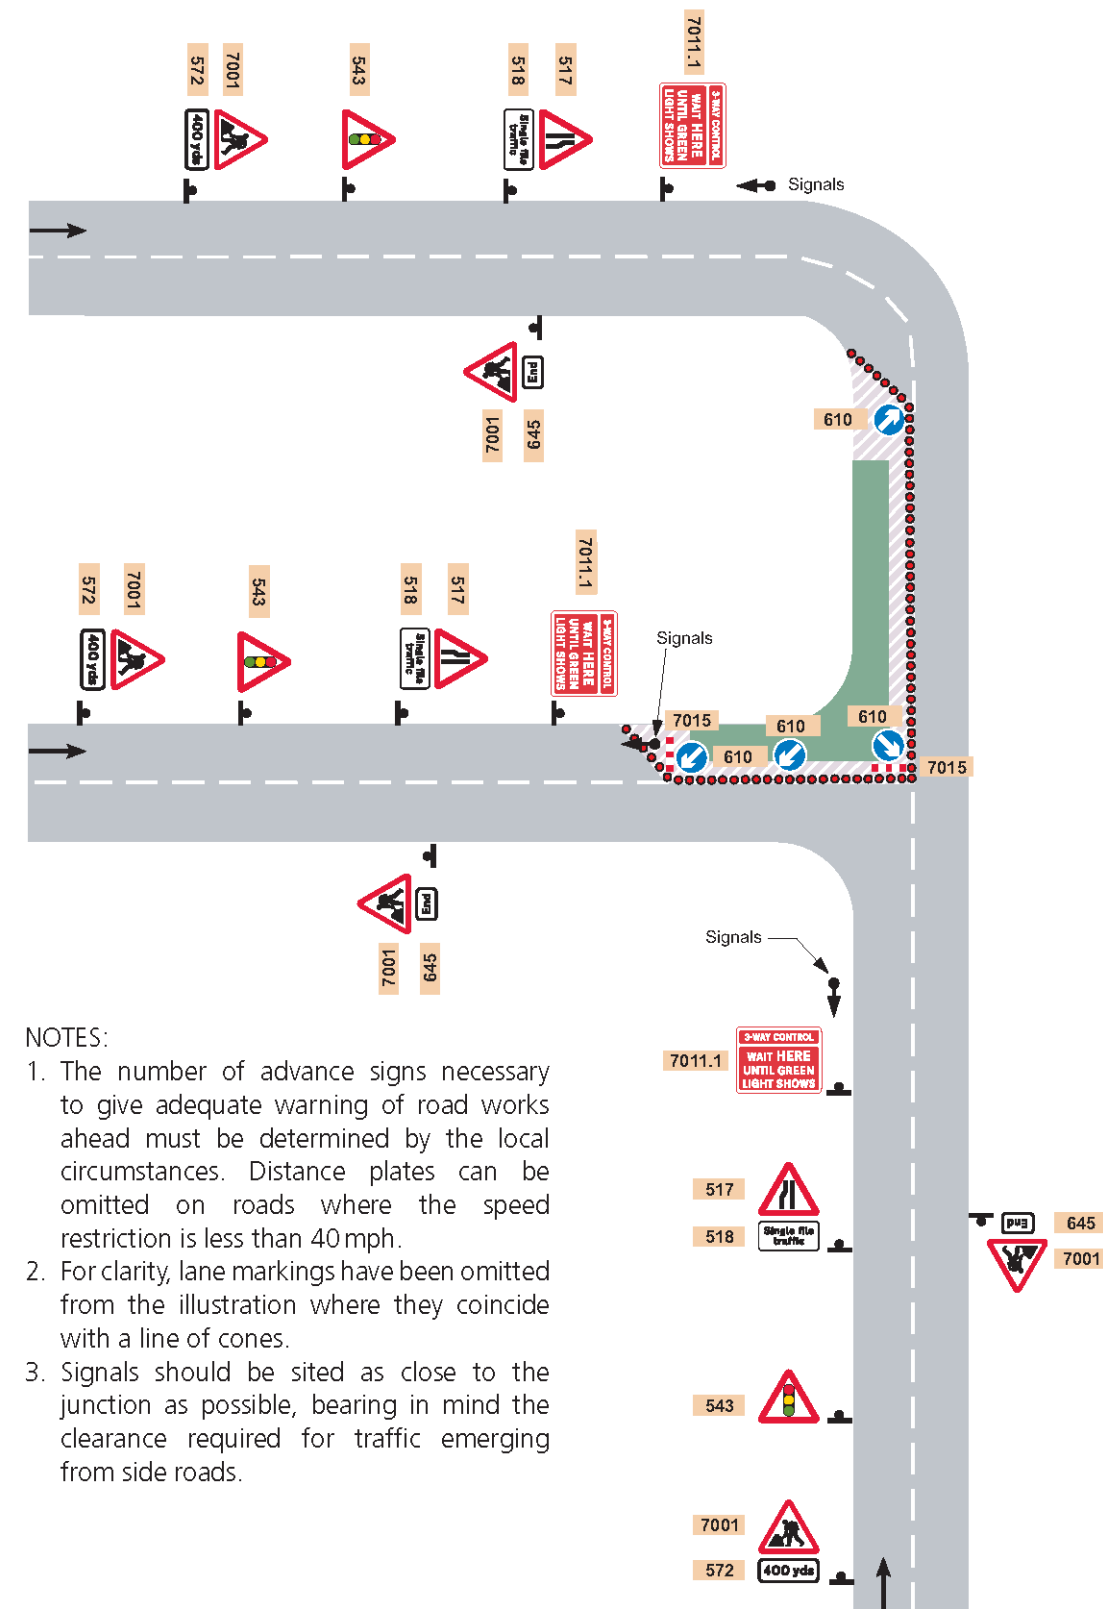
Layout of Signs for Road Works on Single Carriageway Roads with Diversions.
